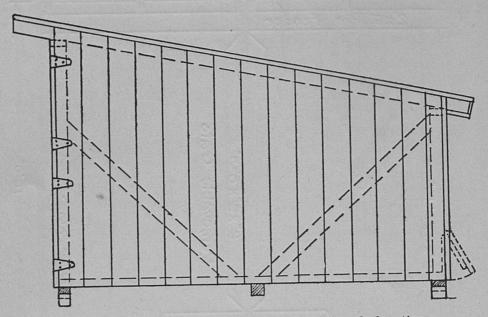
Two Pen Hog House, plan C 6-74-1, end elevation.
